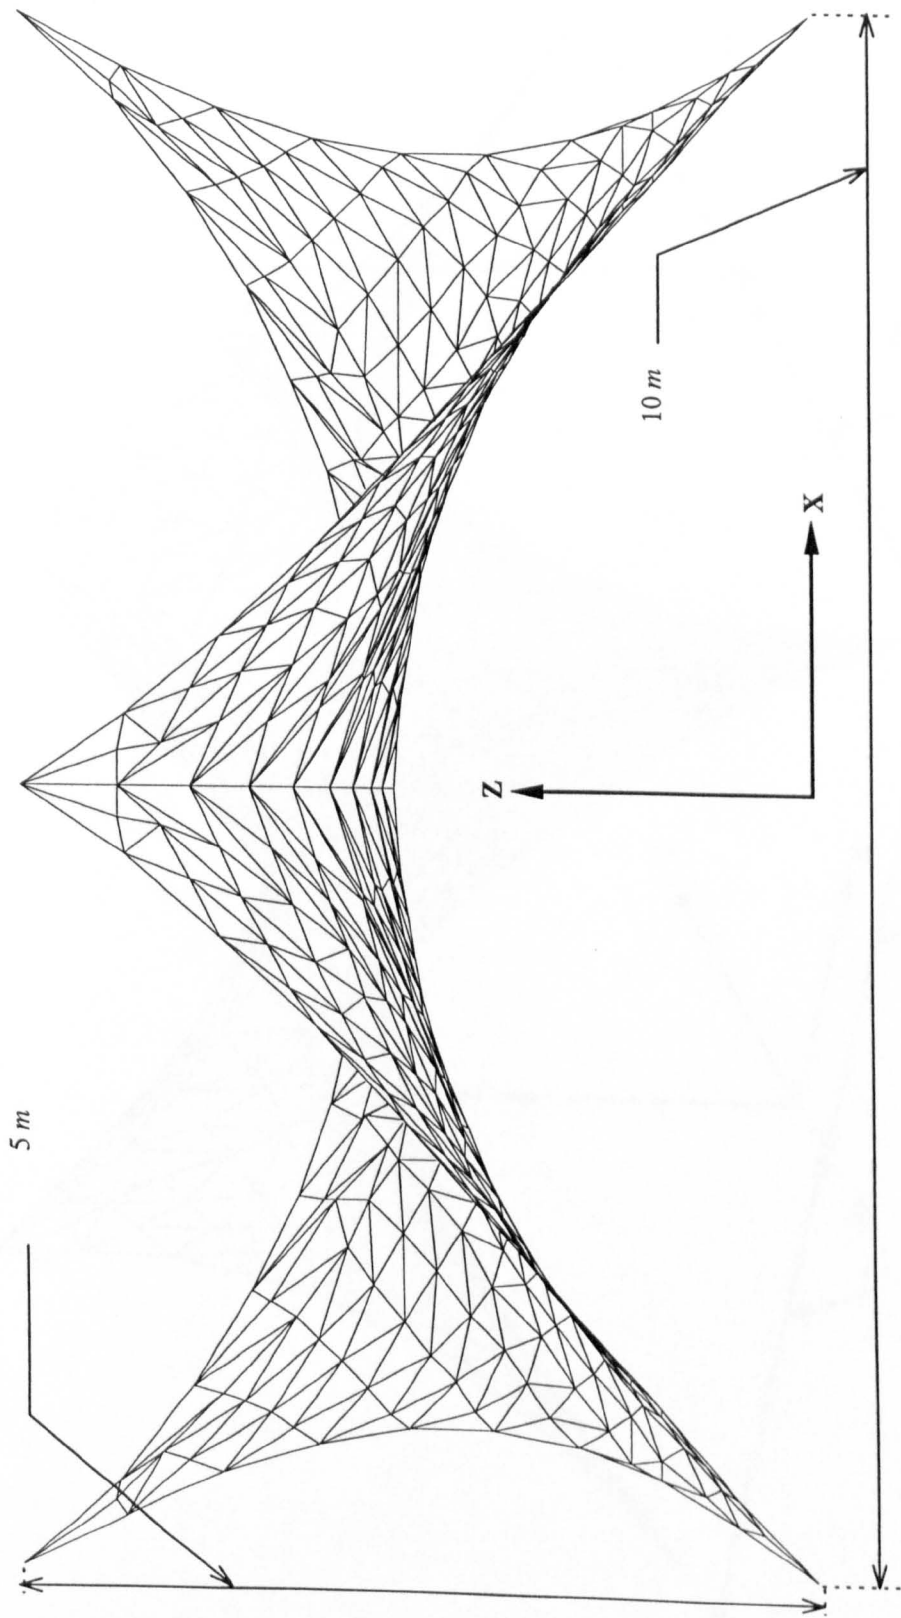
Example 5.2.7.1 - Side Elevation (Cross-Section BB').
